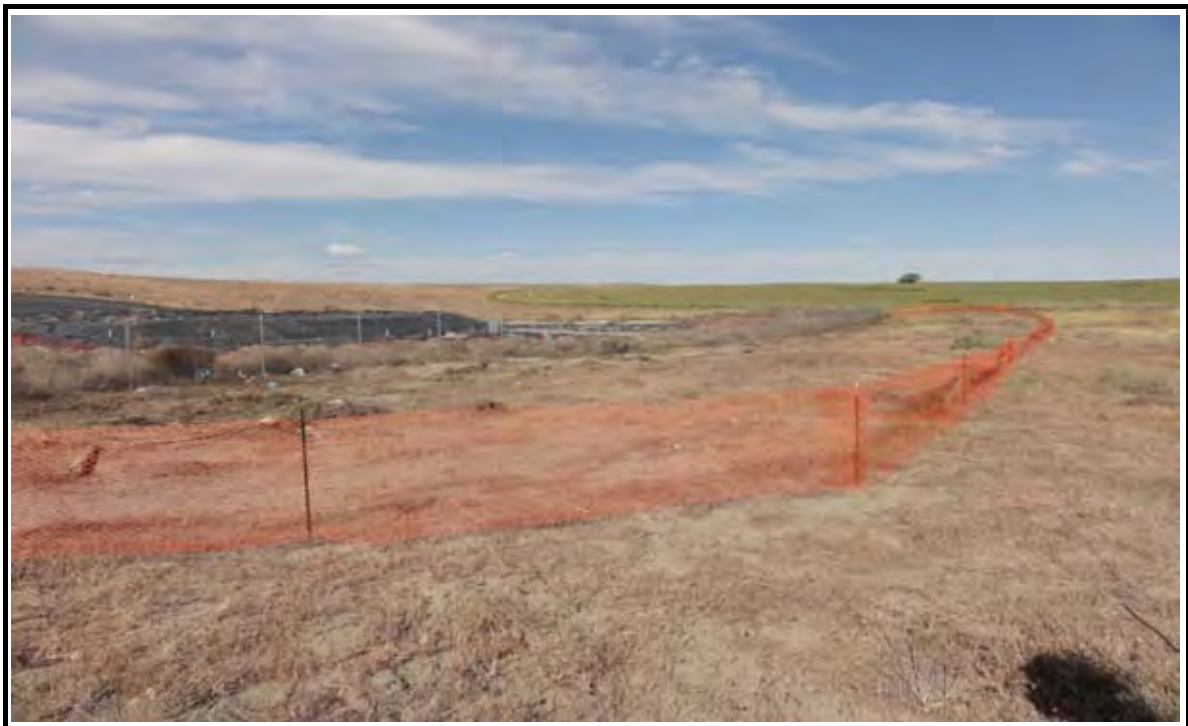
View of the new orange perimeter construction fence along the southern side of the site. View looking east from the northwest corner of the site.
